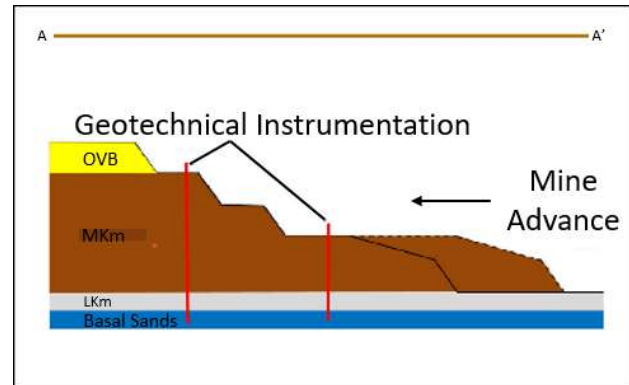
Typical geotechnical instrumentation arrangement along the final limits.
